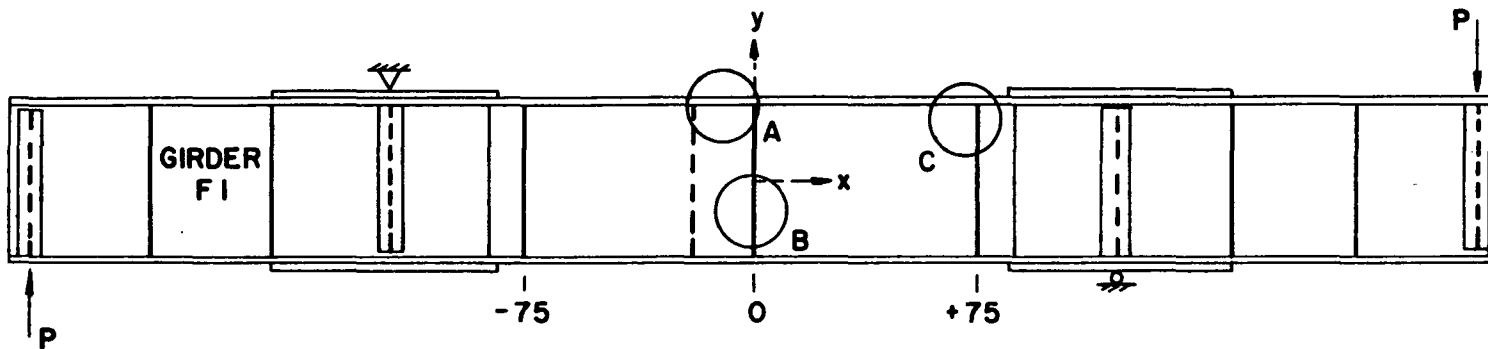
Crack Location and Repairs, Girder F1
